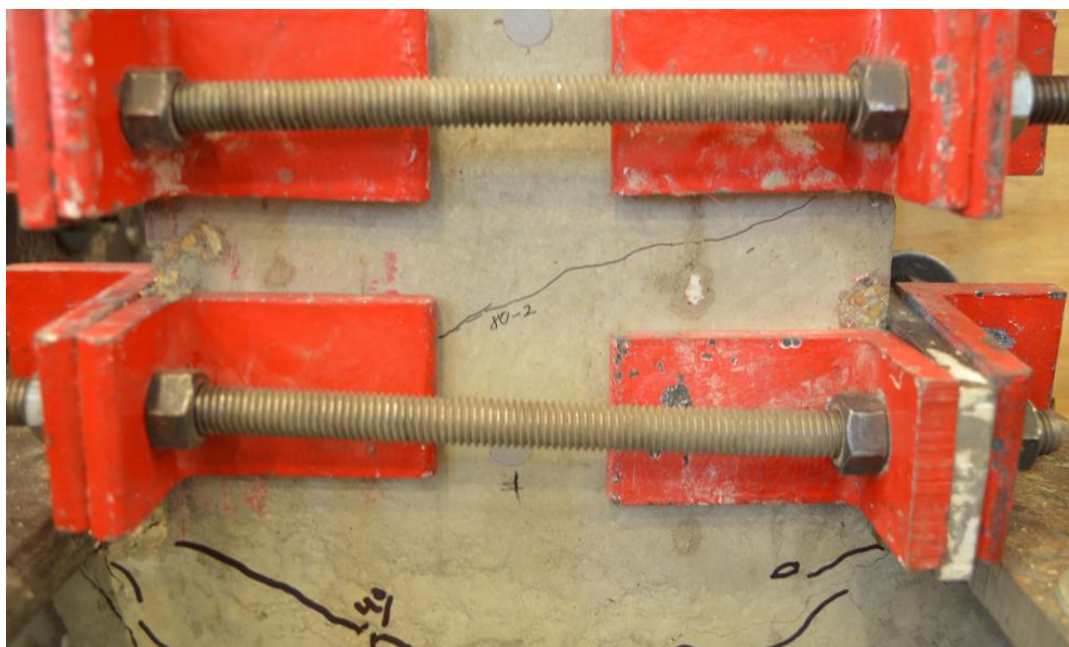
Hairline Diagonal Shear Crack at North Column Base after Frame 2 Run 133, Series F2-R-C-2PB
